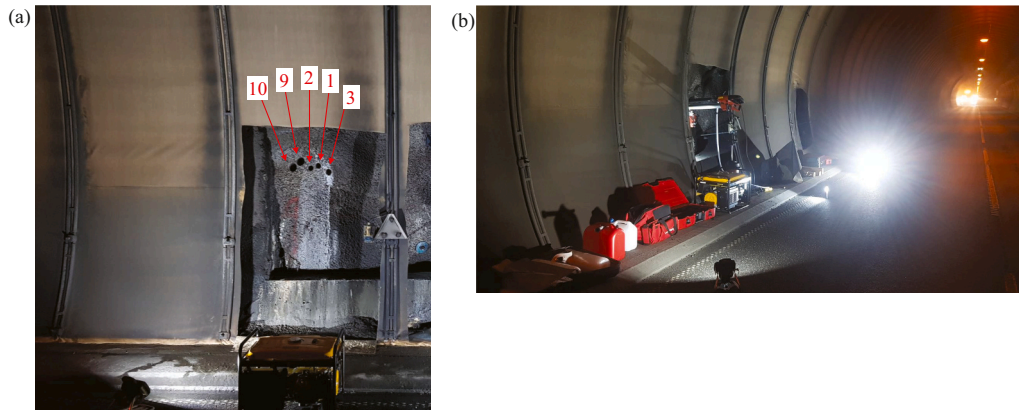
Investigated location in the Frøya tunnel in the middle of the tunnel at chainage 5 + 590. (a) Five shotcrete cores already extracted with the corresponding shotcrete label, and (b) wall mounted drilling equipment.
